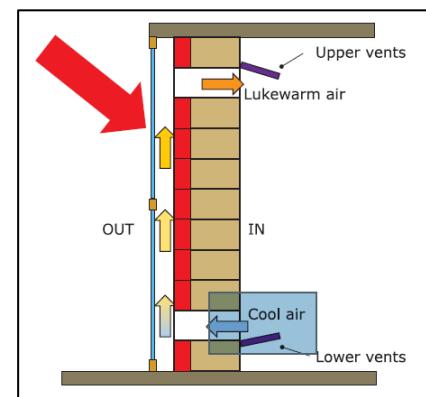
Storage of heat in the Trombe Wall [8] (color scheme)
